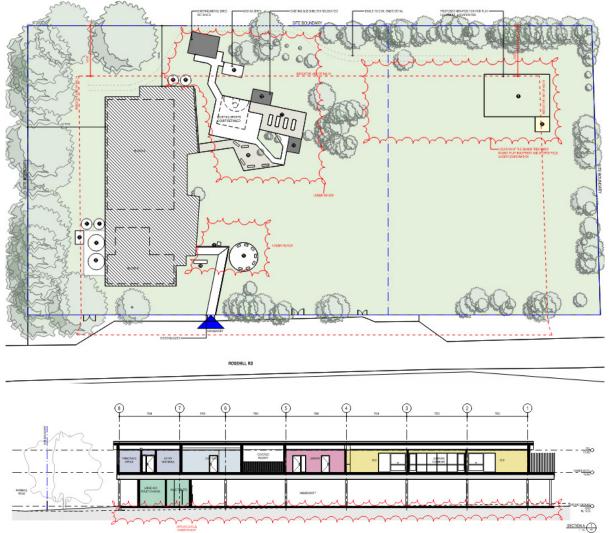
(top) and 4 (bottom): Architectural site plan and section (respectively) of the proposed development. Pedavoli Architects 2023
